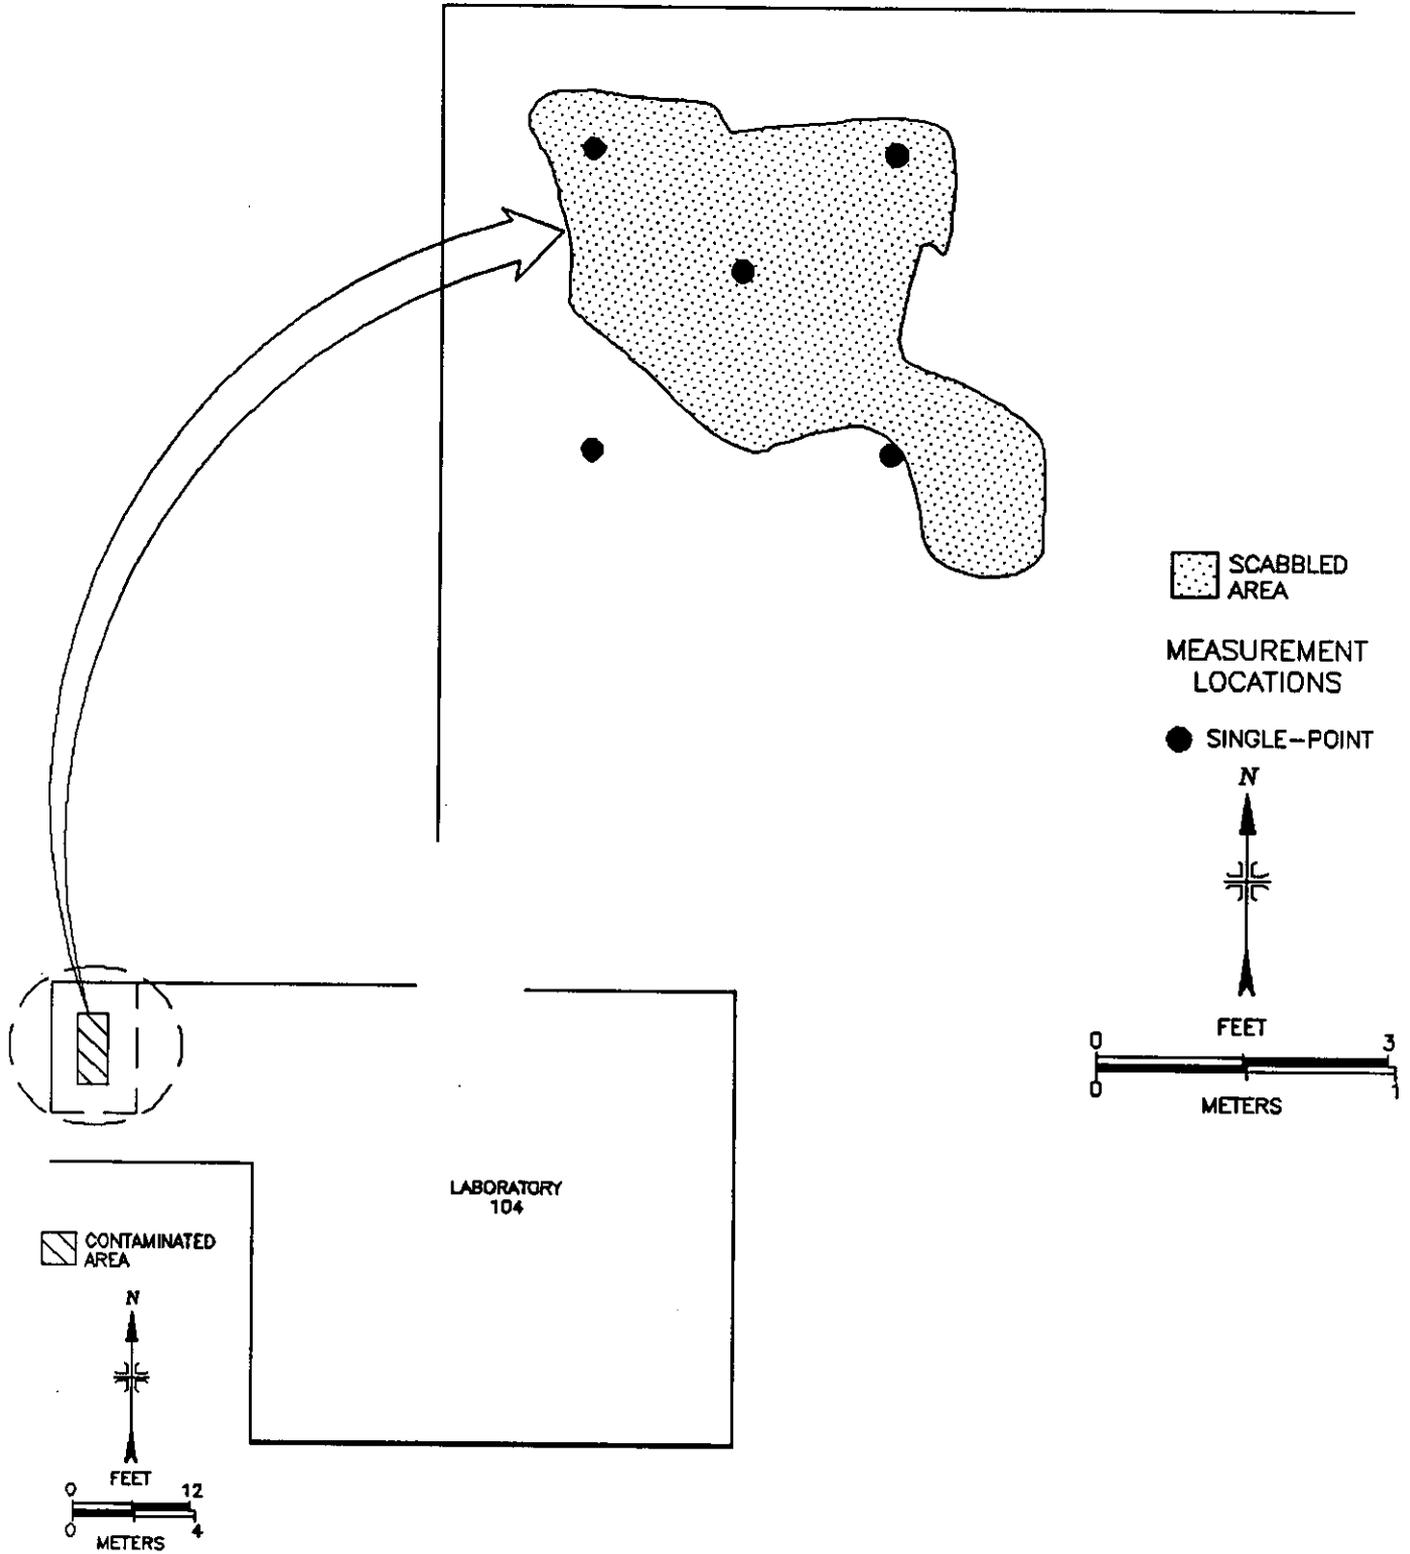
Building 24, Room 104, Indicating Measurement Locations on the Northwest Corner of the Floor
